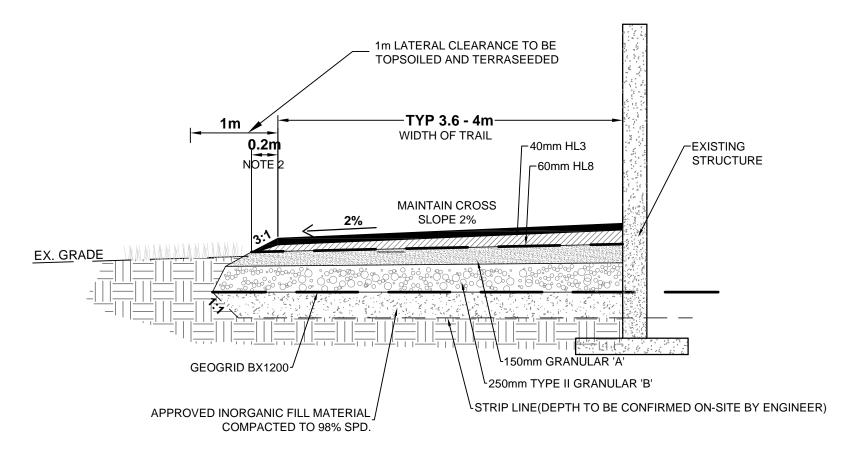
TYPICAL CROSS SECTION (3.6-4m WIDE)
